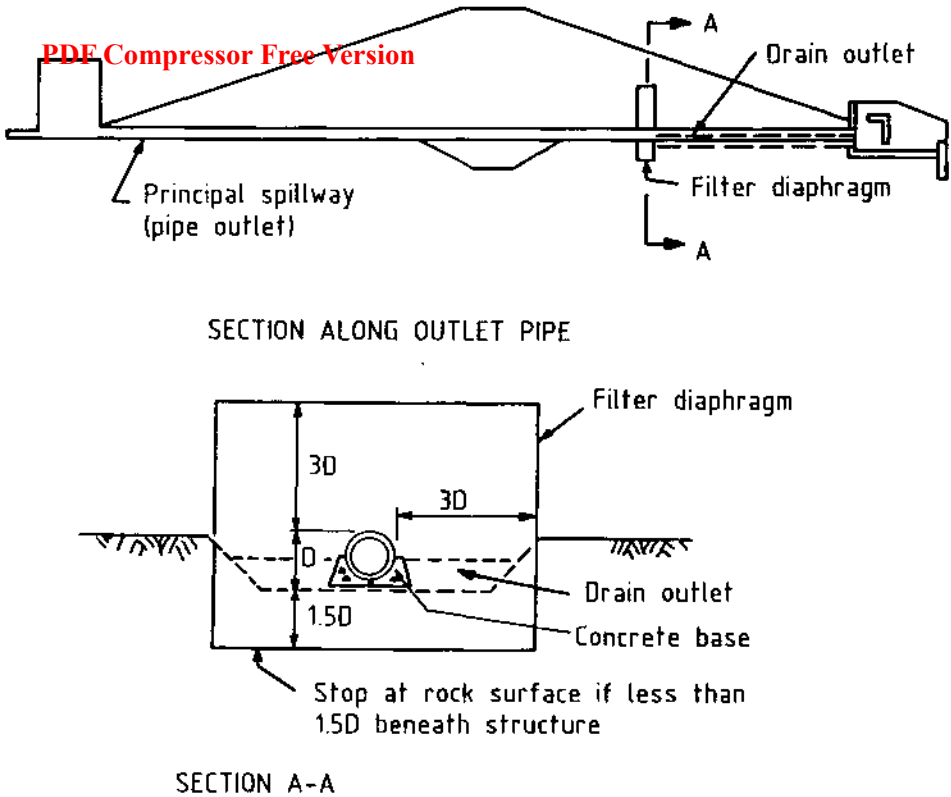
Filter diaphragm for seepage and piping control around outlet pipe (Talbot & Ralston 1985).
